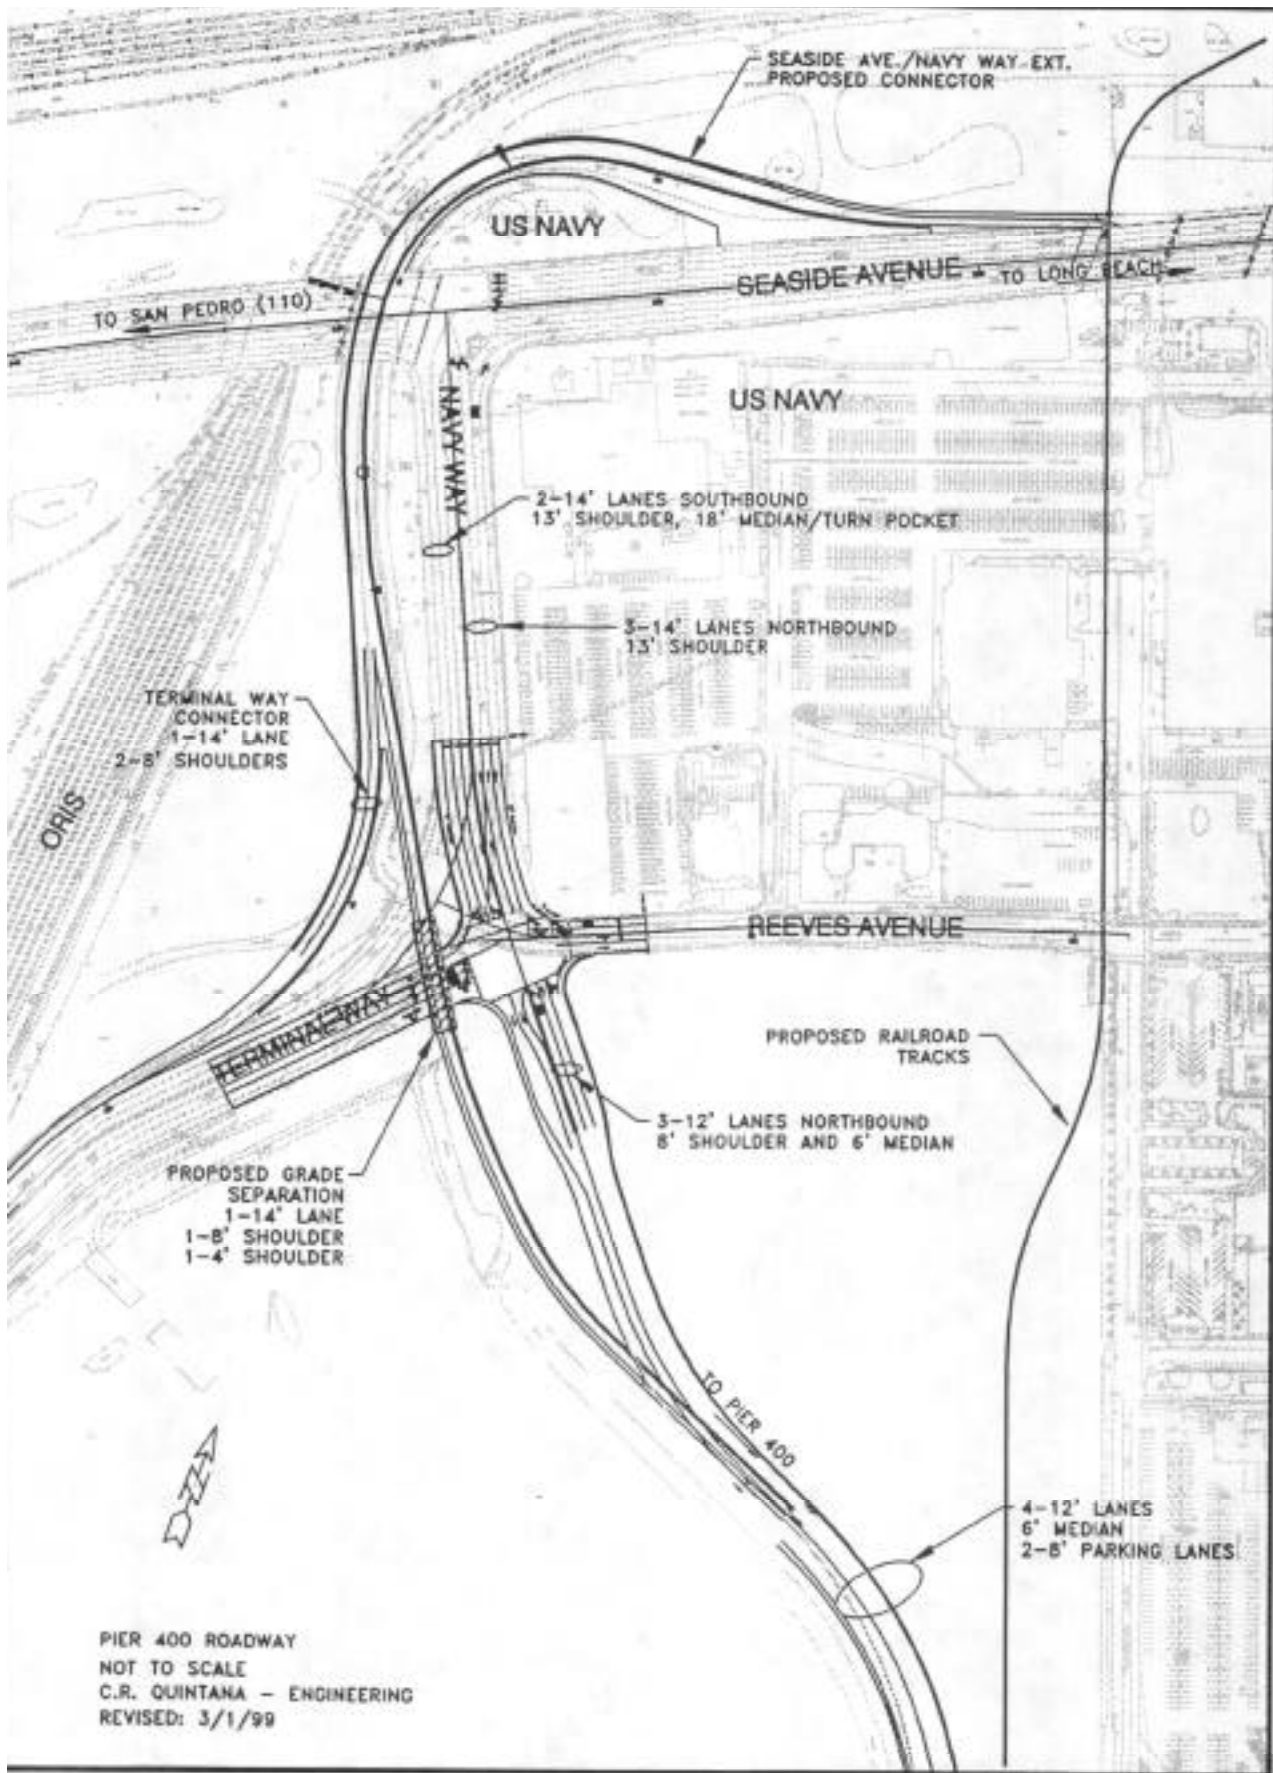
Pier 400 Transportation Corridor - Navy Mole Overhead Rail Alignment
